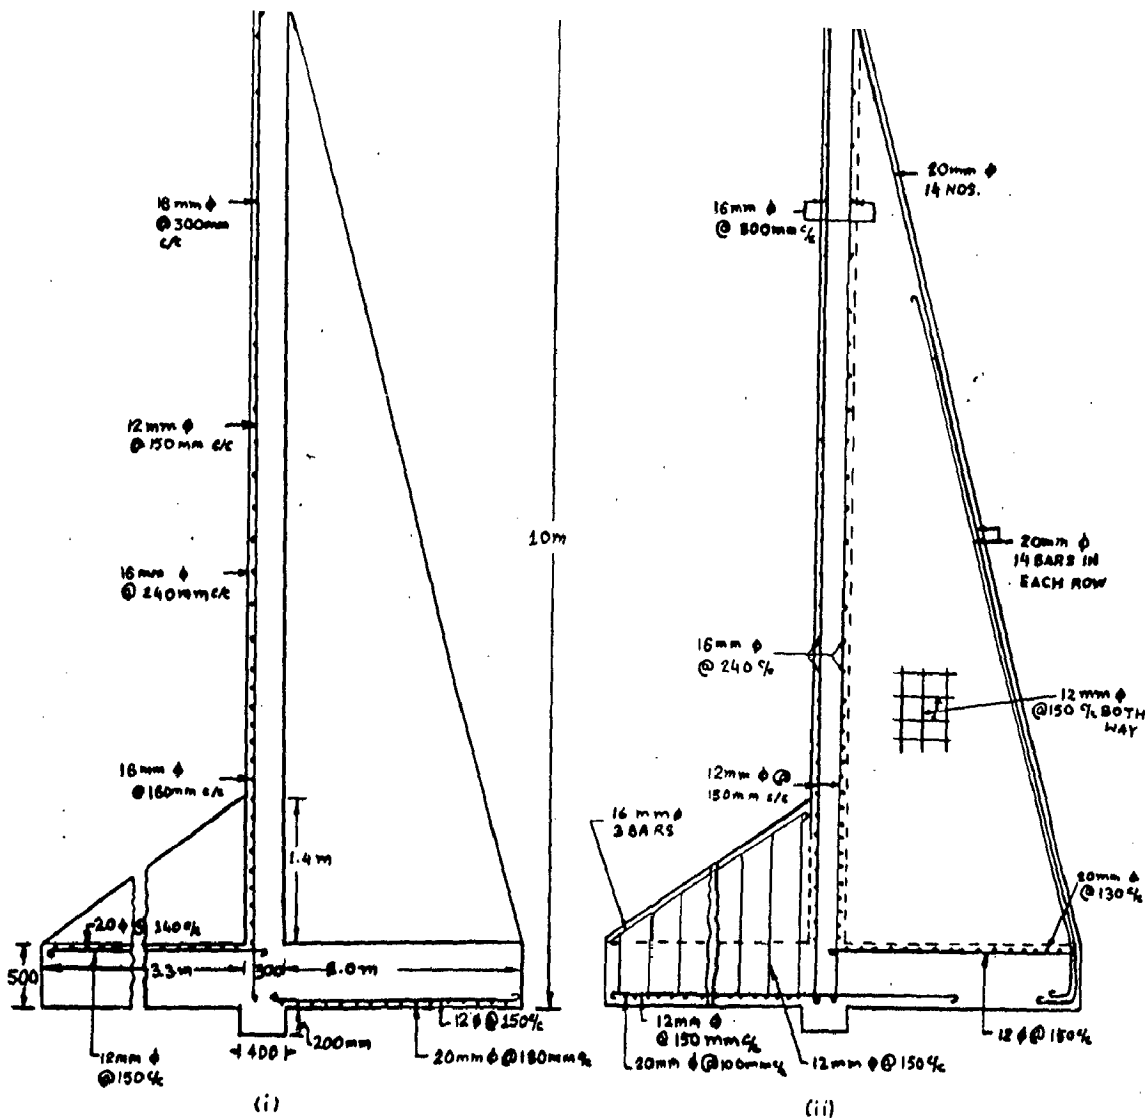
Sections of Retaining wall (i) at midway between counter fort, (ii) through counter fort.
